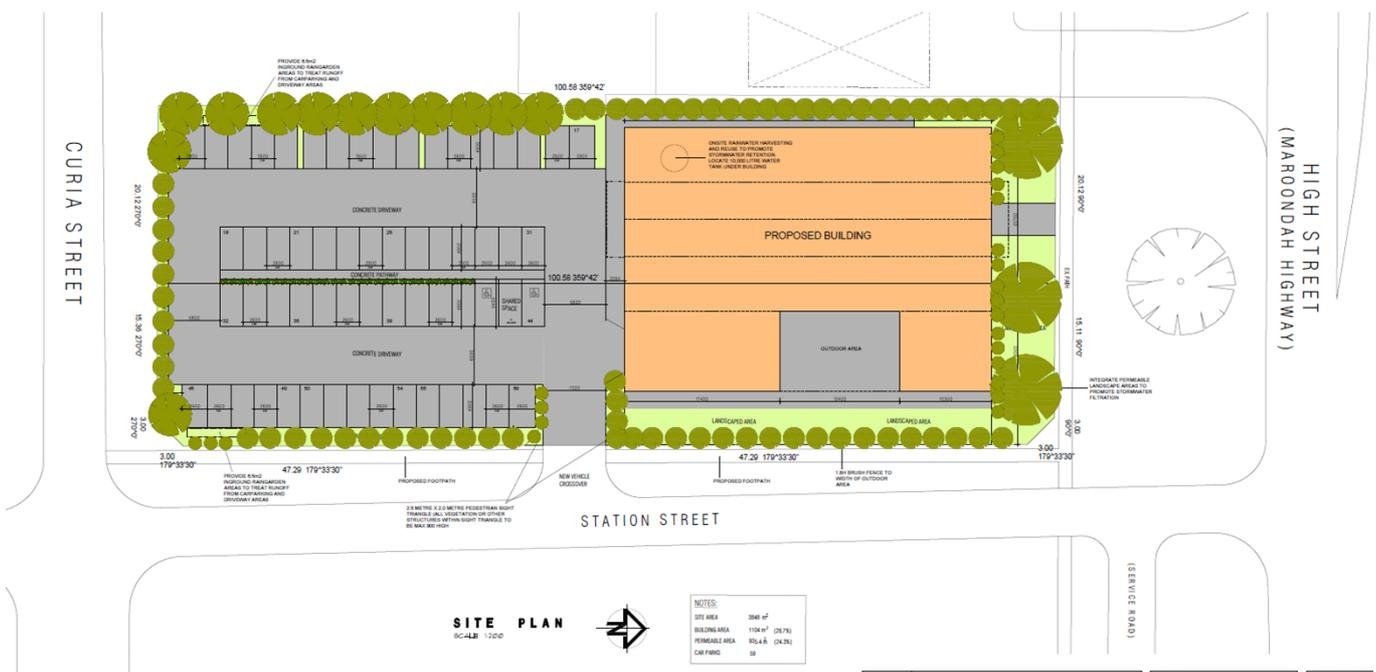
Proposed site plan with indicative landscaping. Source: Application documents.
